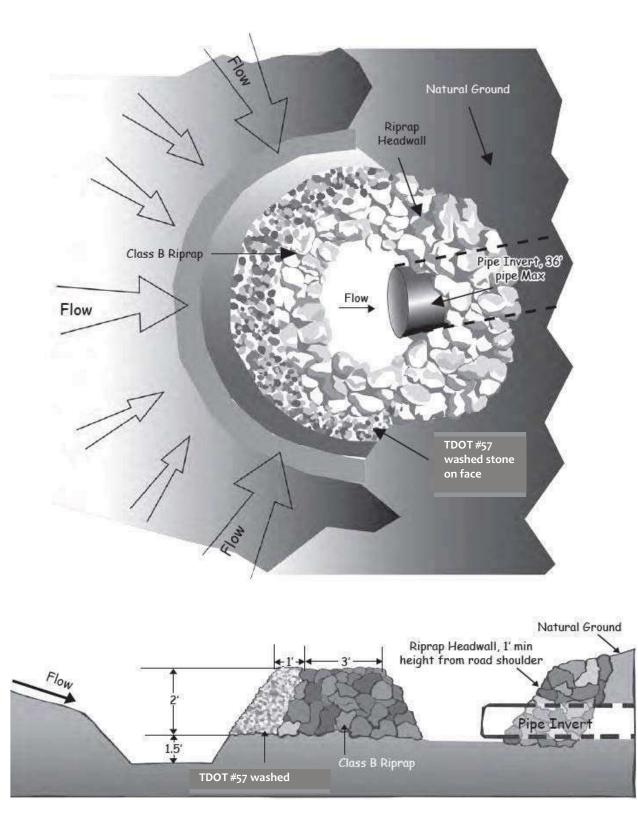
Rock Pipe Inlet Protection (Source: NCDENR)
